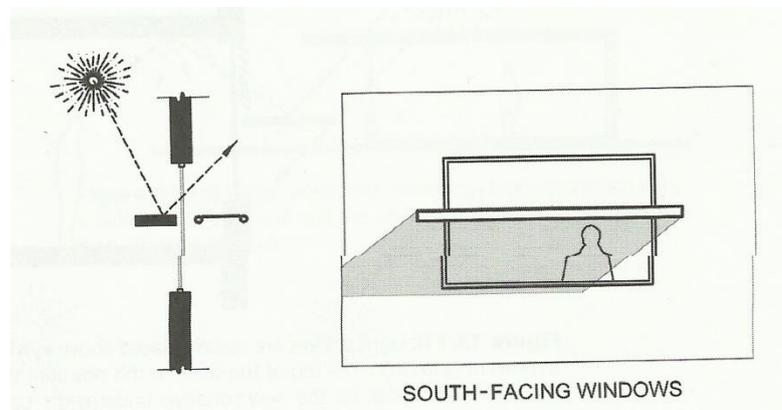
Lightshelf on a South Facing Façade (Lechner, 2001)
